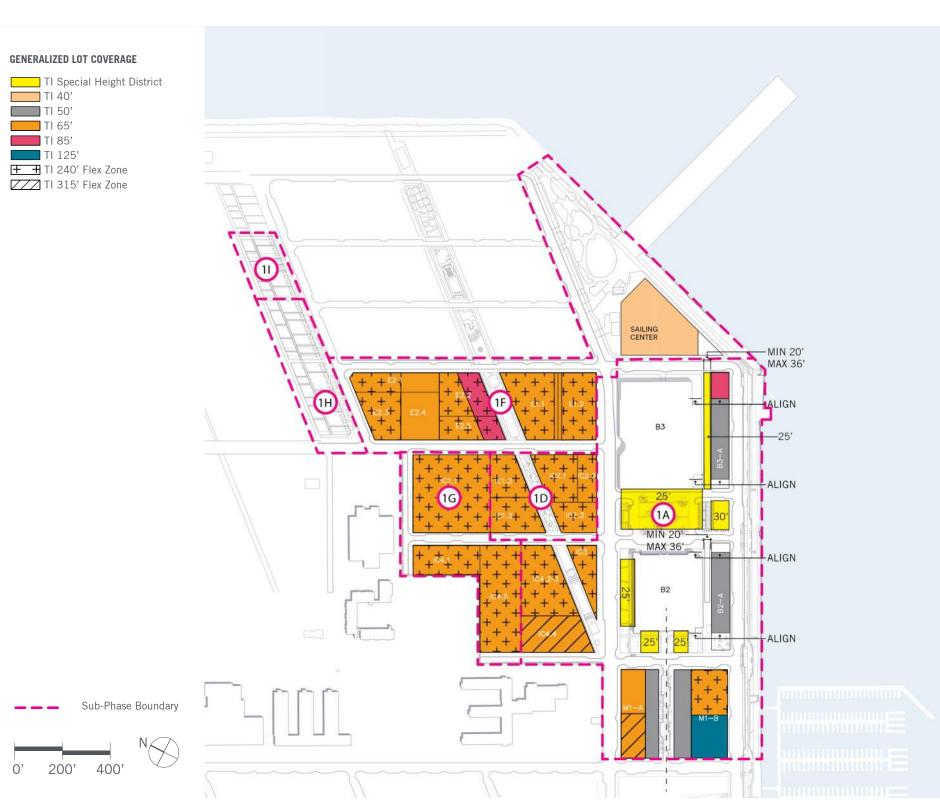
SUB-PHASE BUILDING MAXIMUM HEIGHTS AND MASSING PLAN
